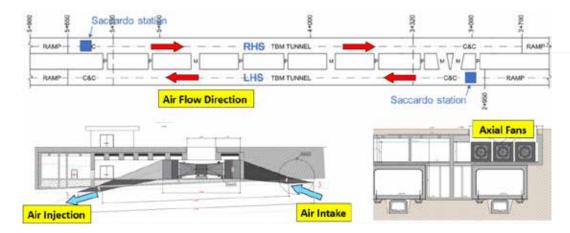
Saccardo Tunnel Ventilation System adopted for MCRP4
